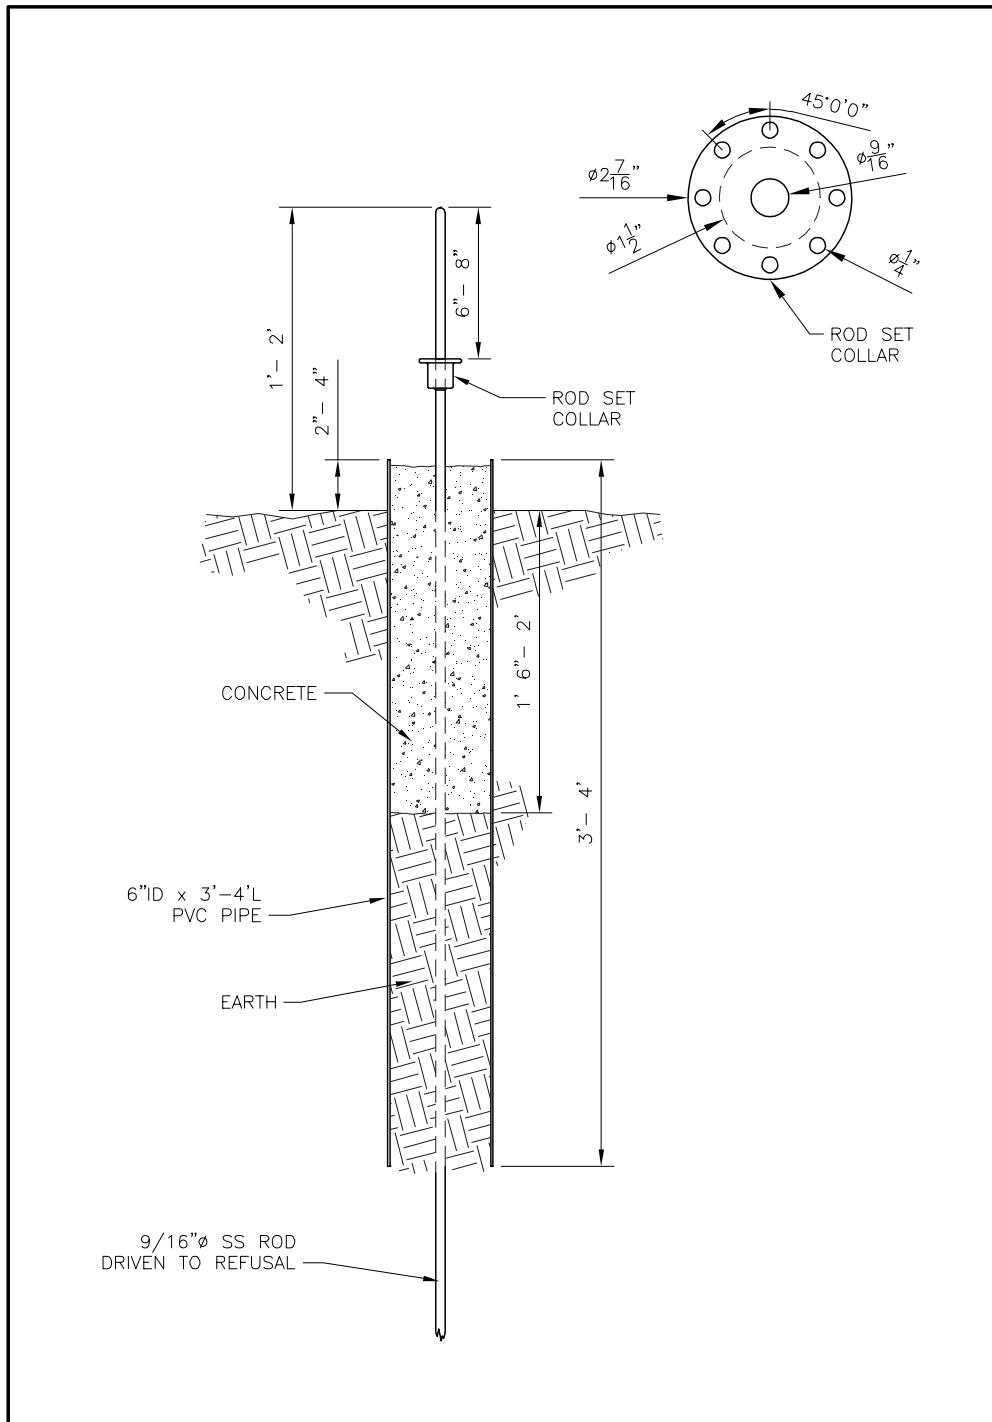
Detail construction drawing of a typical RSET station with collar. Inset: Collar detail.
